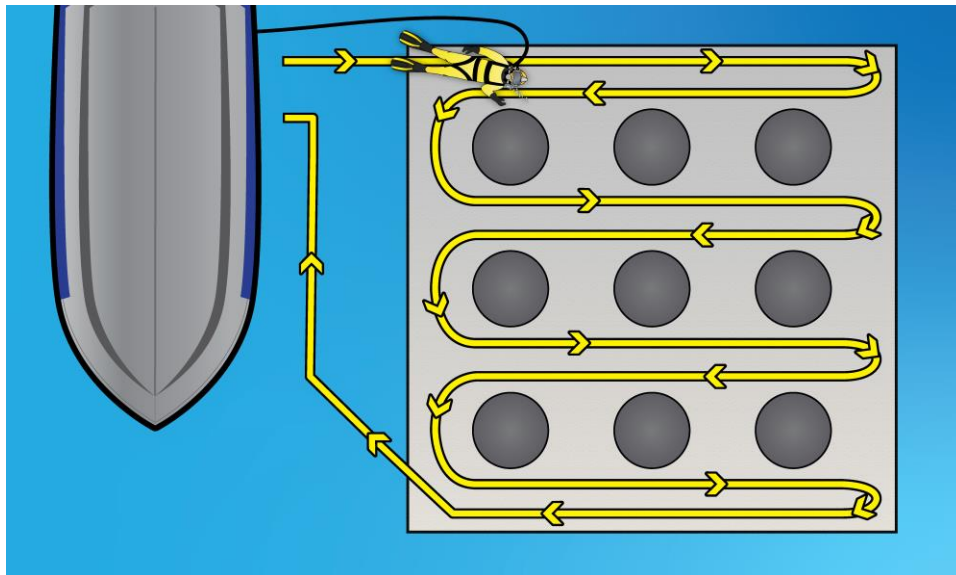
Illustration. Inspection pattern under a waterline footing with SSA.
